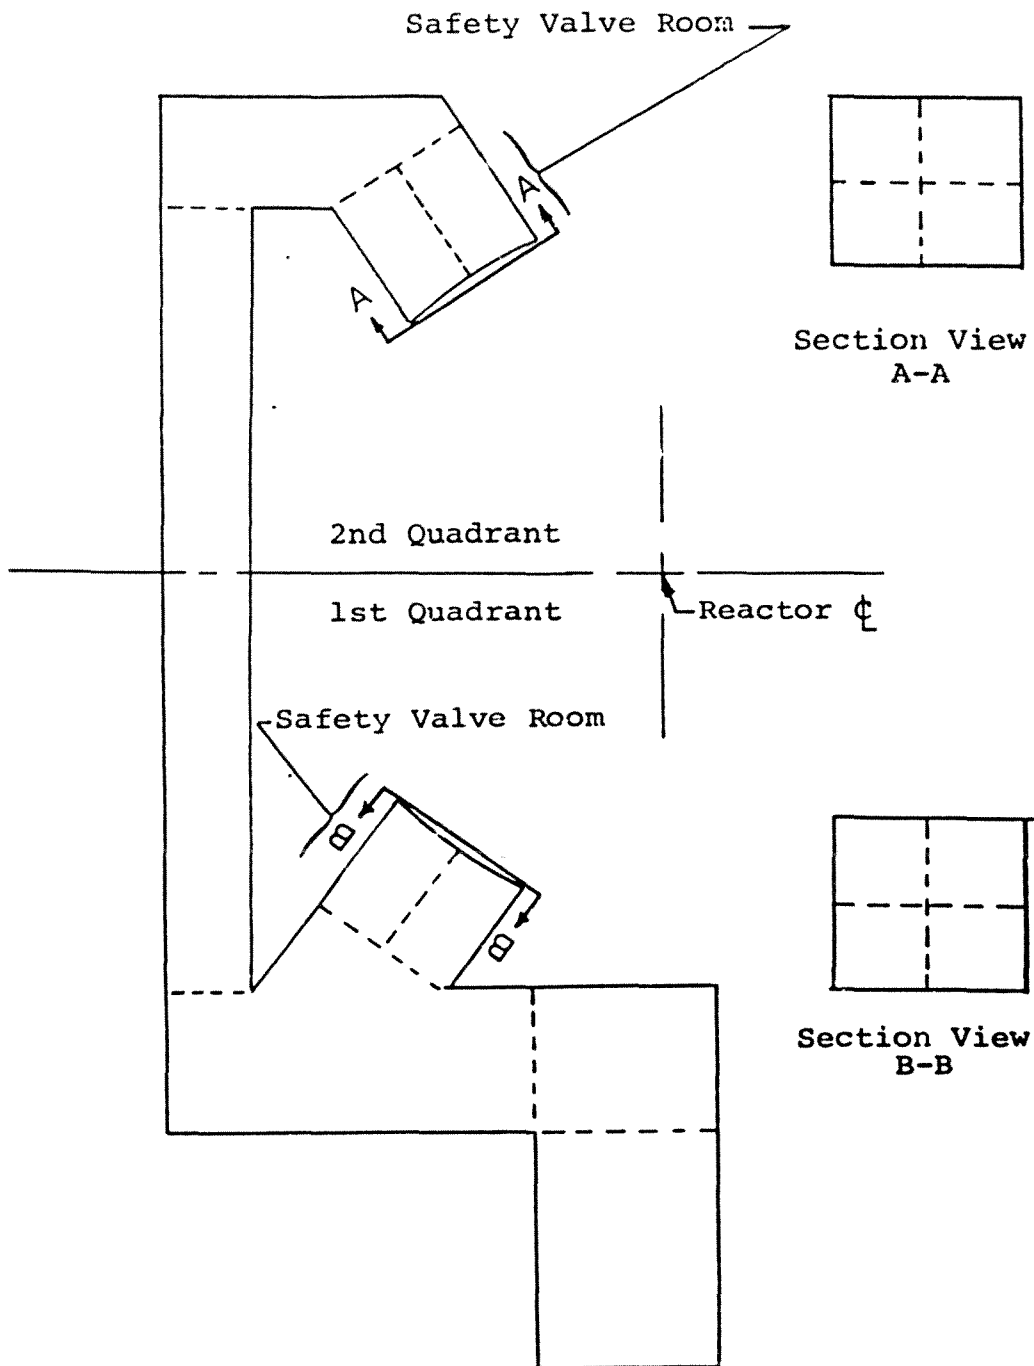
MAIN STEAM TUNNEL VIEW PLAN
